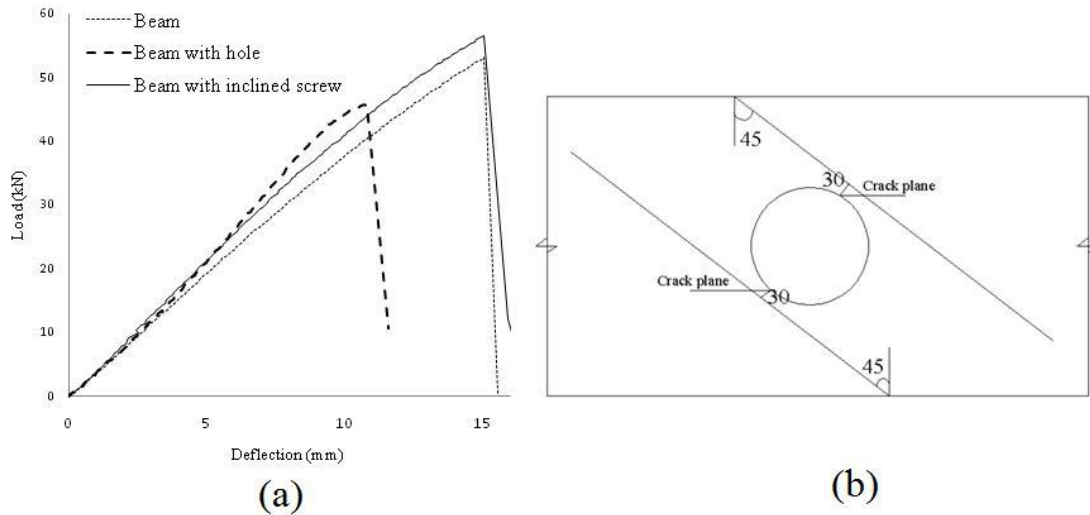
(a) Load-deflection plot at mid-span of the beams, (b) sketch of beam reinforced with inclined screws
